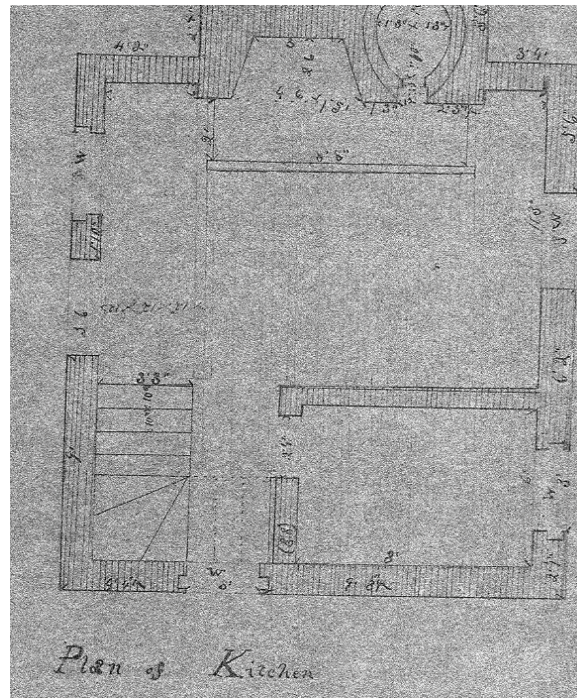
Undated first floor plan of original Kitchen building showing bake oven at upper right.
